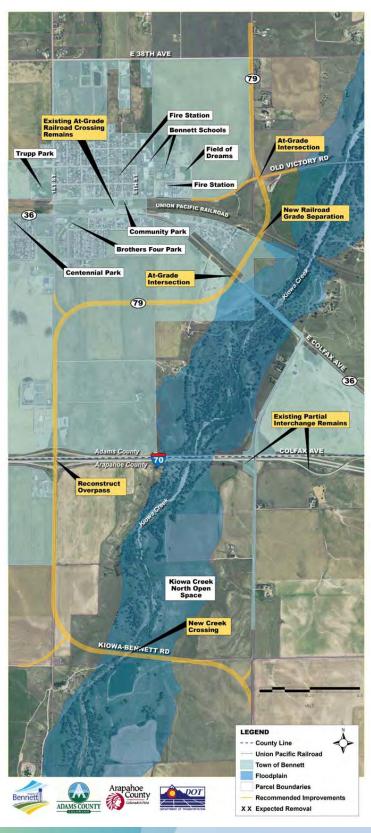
Alternative 3 - East Railroad Crossing with West Kiowa-Bennett Road Interchange Alignment
